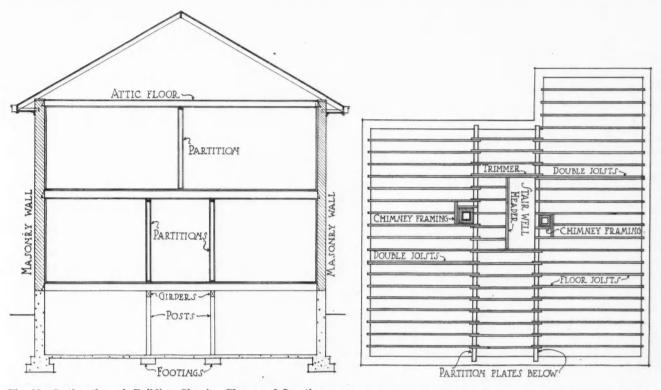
Section through Building, Showing Floors and Location Fig. 55. Plan View of First Floor of Building Shown in Fig. 54. of Partitions.
